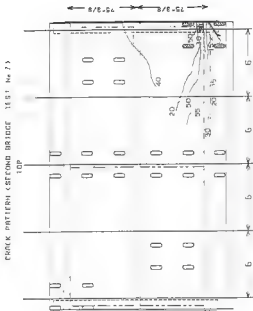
Top Cracking Pattern (Second Bridge - Test No 7)
